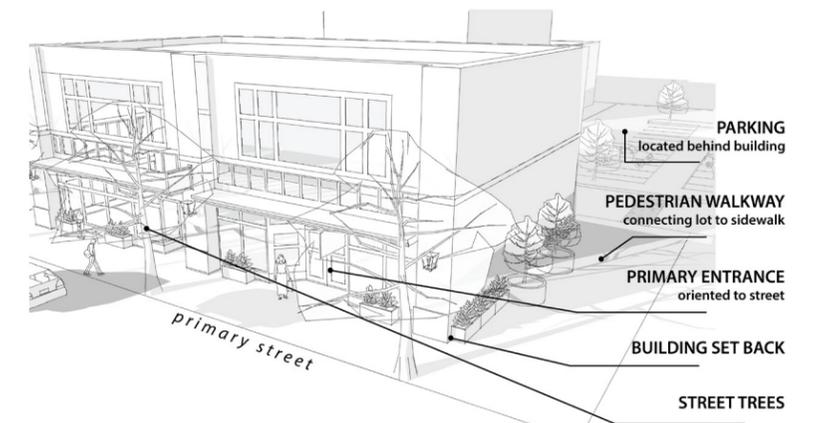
The diagram above illustrates the ideal placement of residential buildings to maximize the lot while addressing the street.
